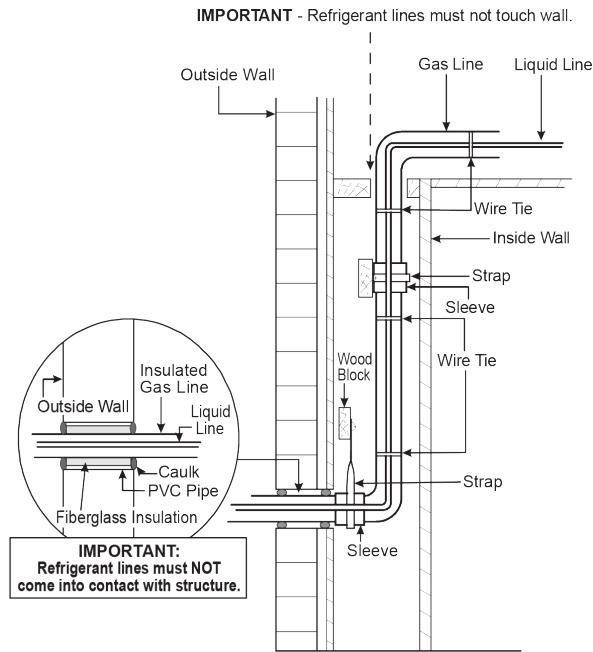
Installation of Refrigerant Piping (Vertical)
